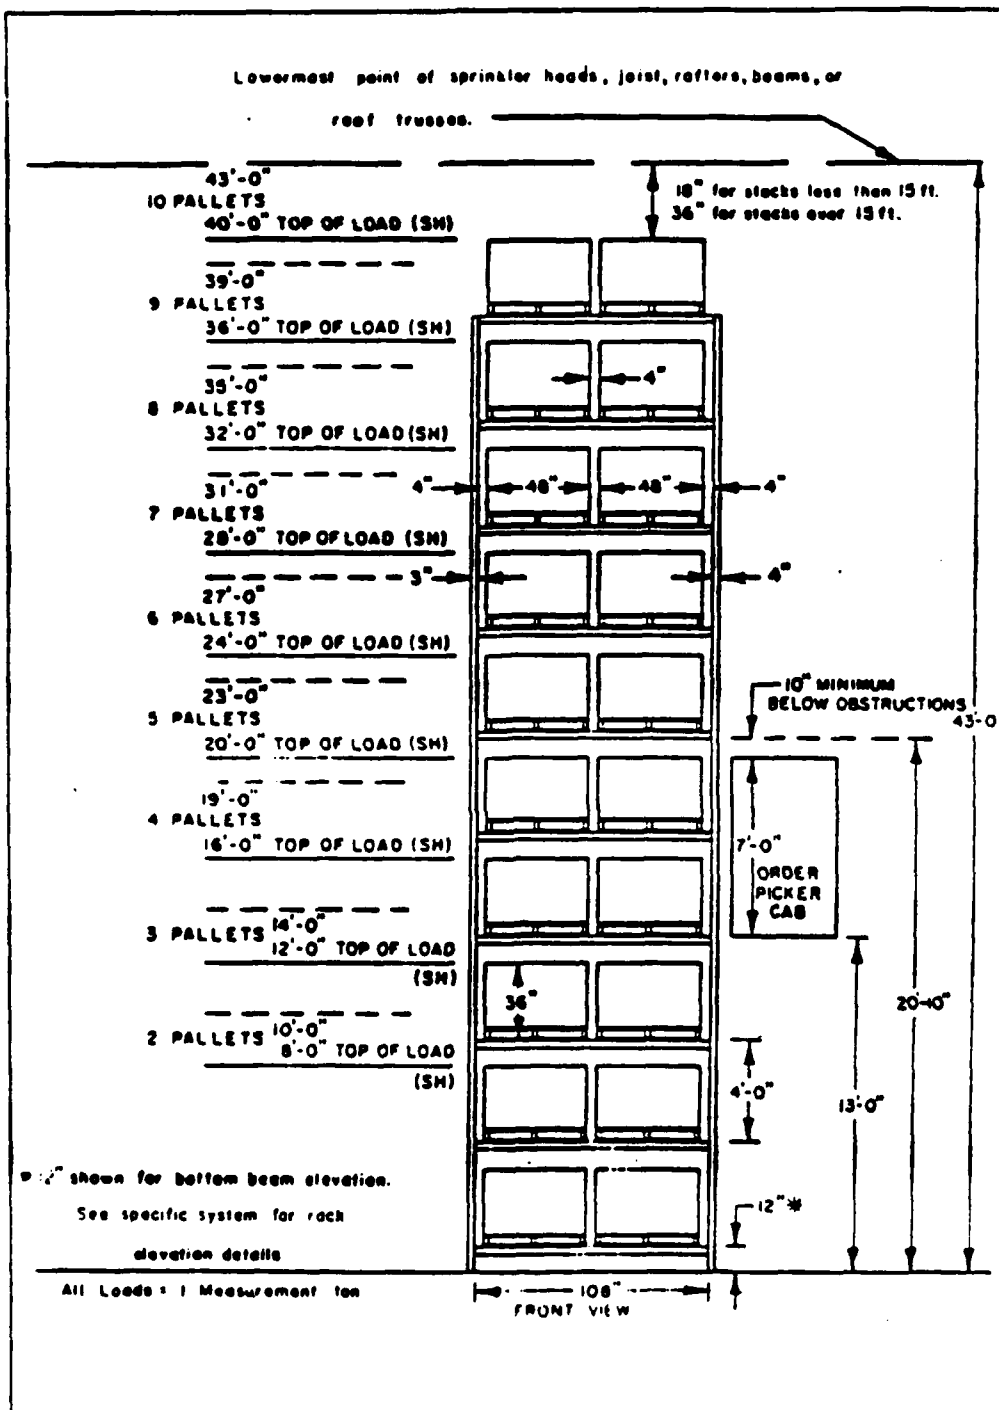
TYPICAL PALLET RACK ELEVATION
